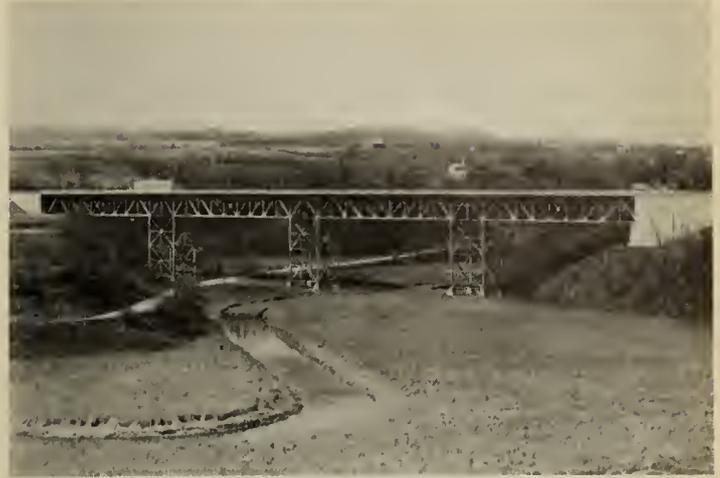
Highway Viaduct at Eastern Entrance to Hamilton, Ont. Typical steel truss and tower viaduct on Ontario provincial highway. 1921.
